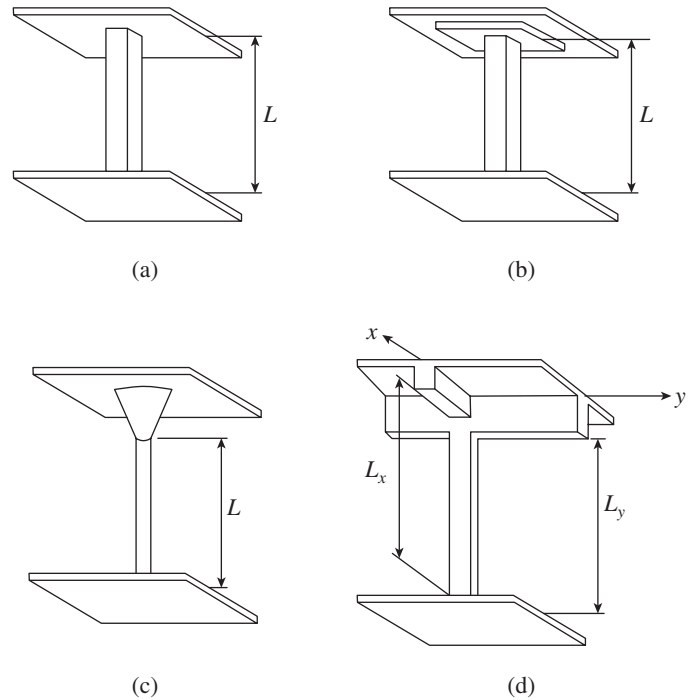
Unsupported length of columns (a) Flat plate (b) Flat slab (c) Column capital (d) Slab with beams
